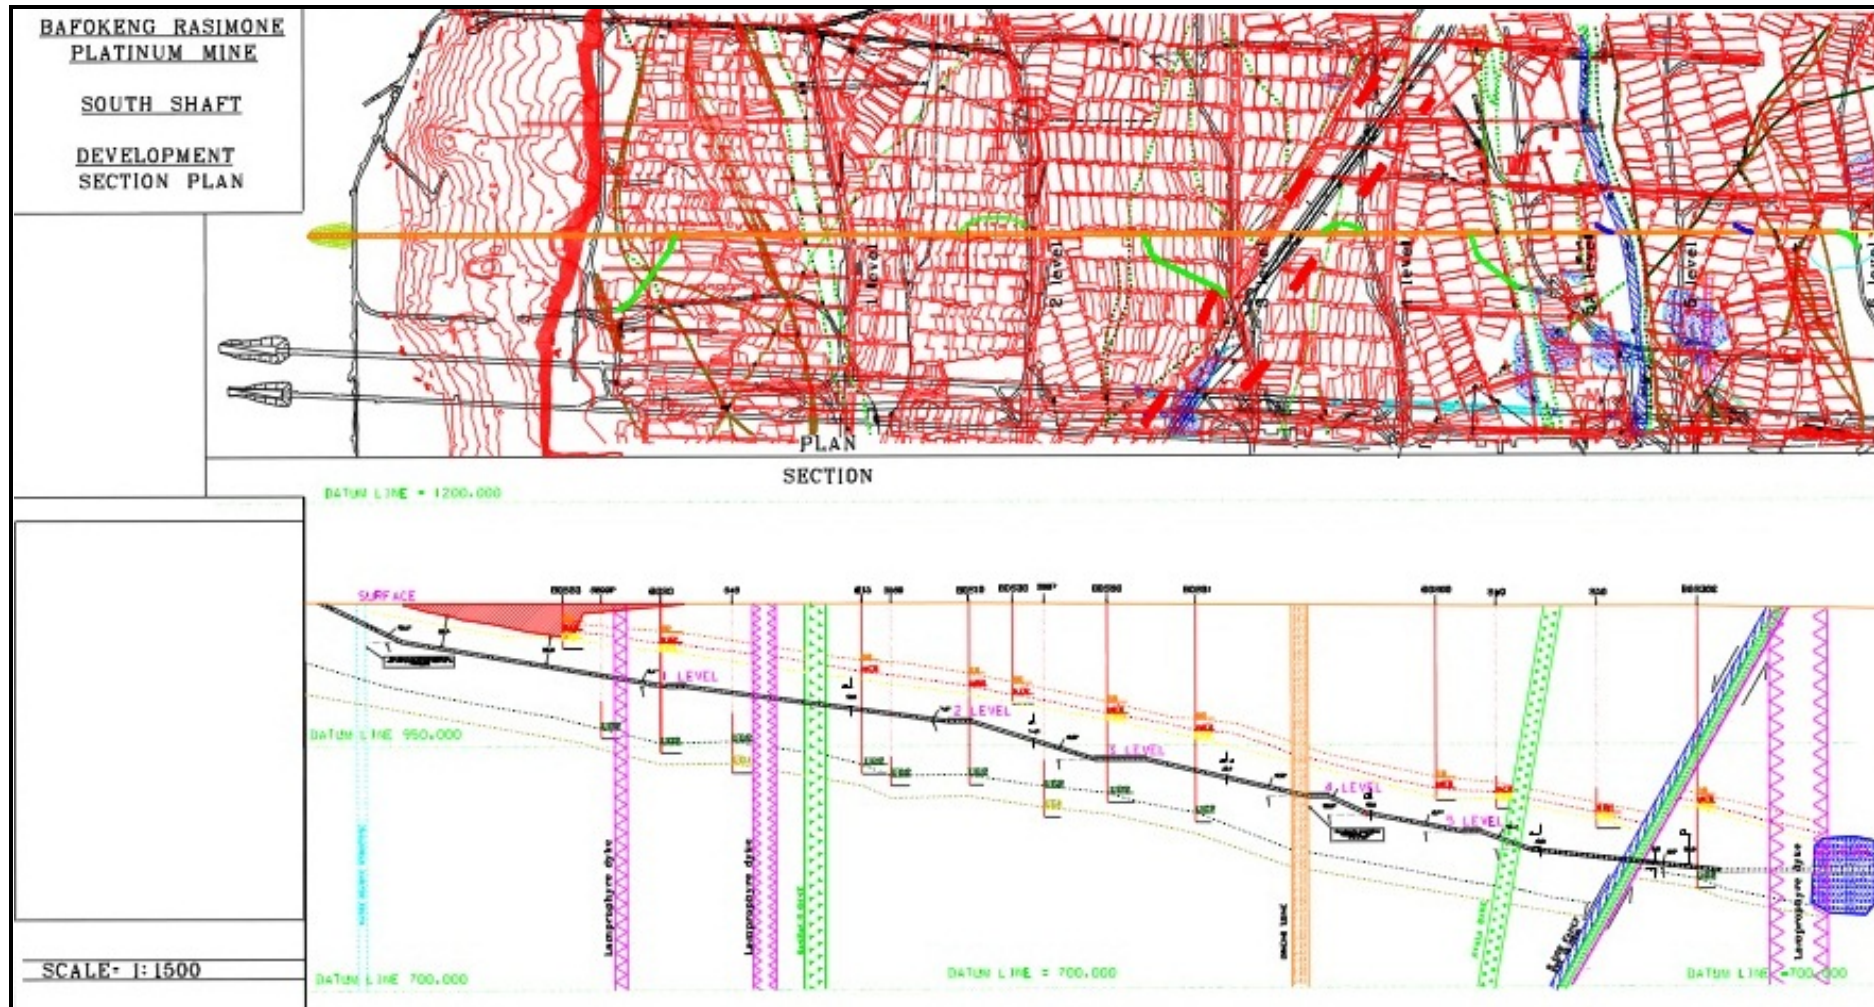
Plan and section view of the South Shaft chairlift decline system (design) (BRPM, 2013)
